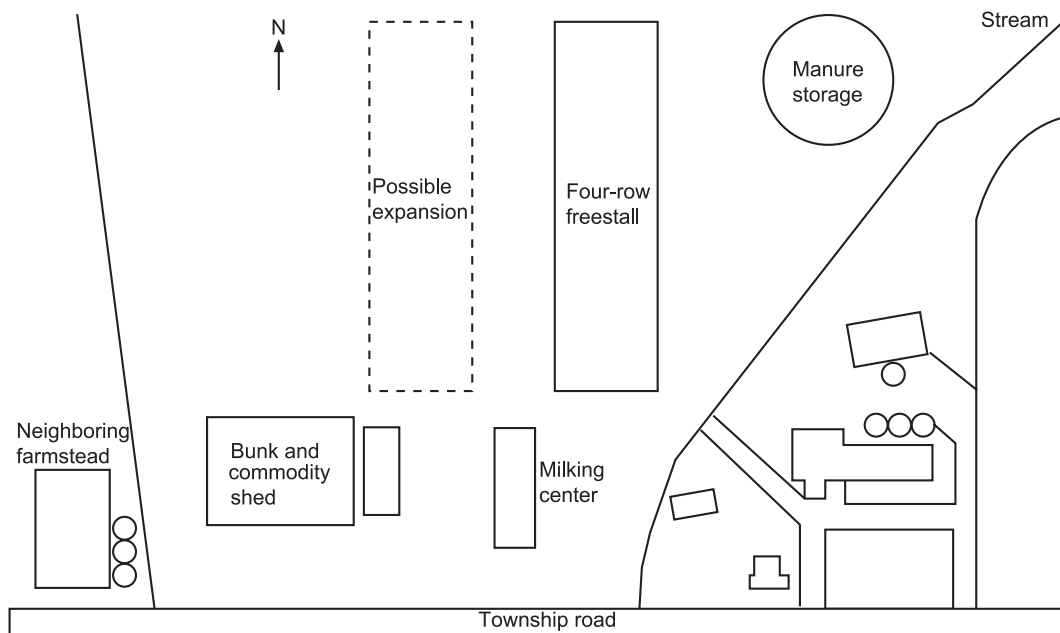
Map of proposed layout of new facilities, with additional expansion, in relation to existing facilities.
